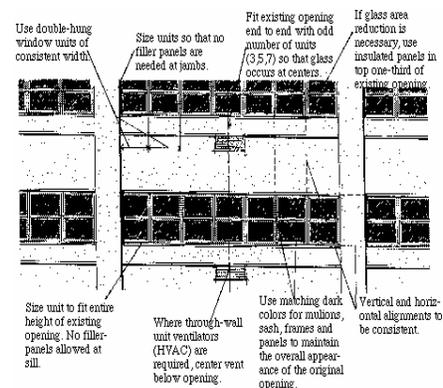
Criteria for renovation of existing horizontal strip windows.
